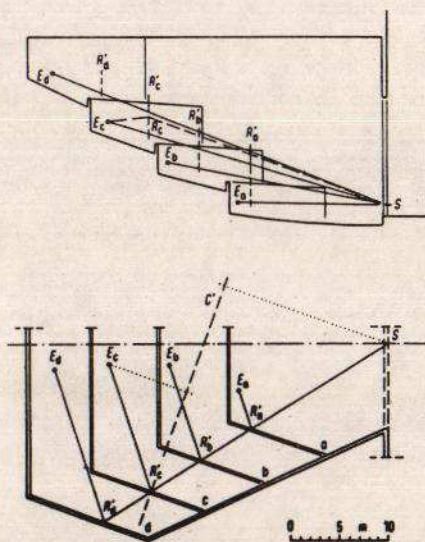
Longitudinal section (top) and half plan (bottom) of a symmetrical trapezium terraces room.
